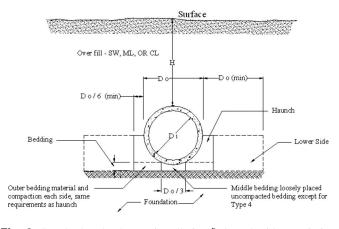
Standard embankment installation [adapted with permission from *Concrete Pipe Technology Handbook* (ACPA)]
